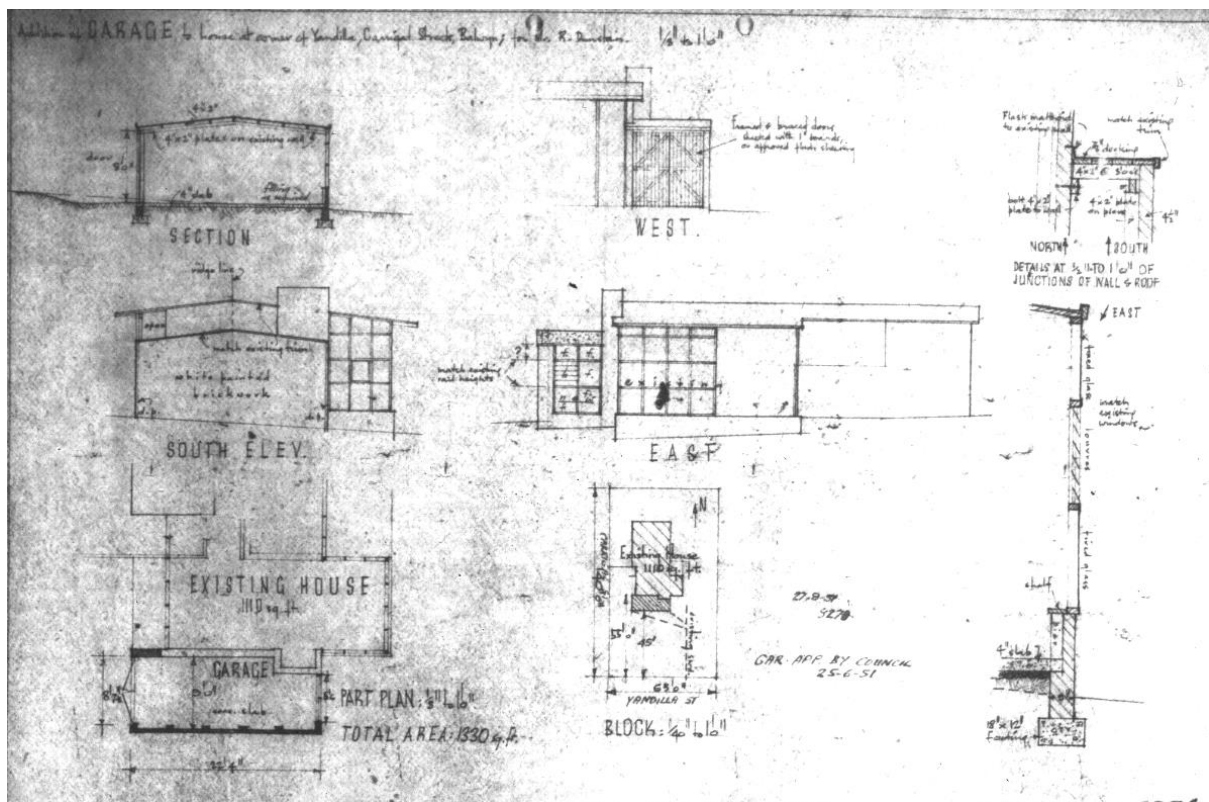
Building application plan showing the proposed garage addition. (Source: BP 1951)
